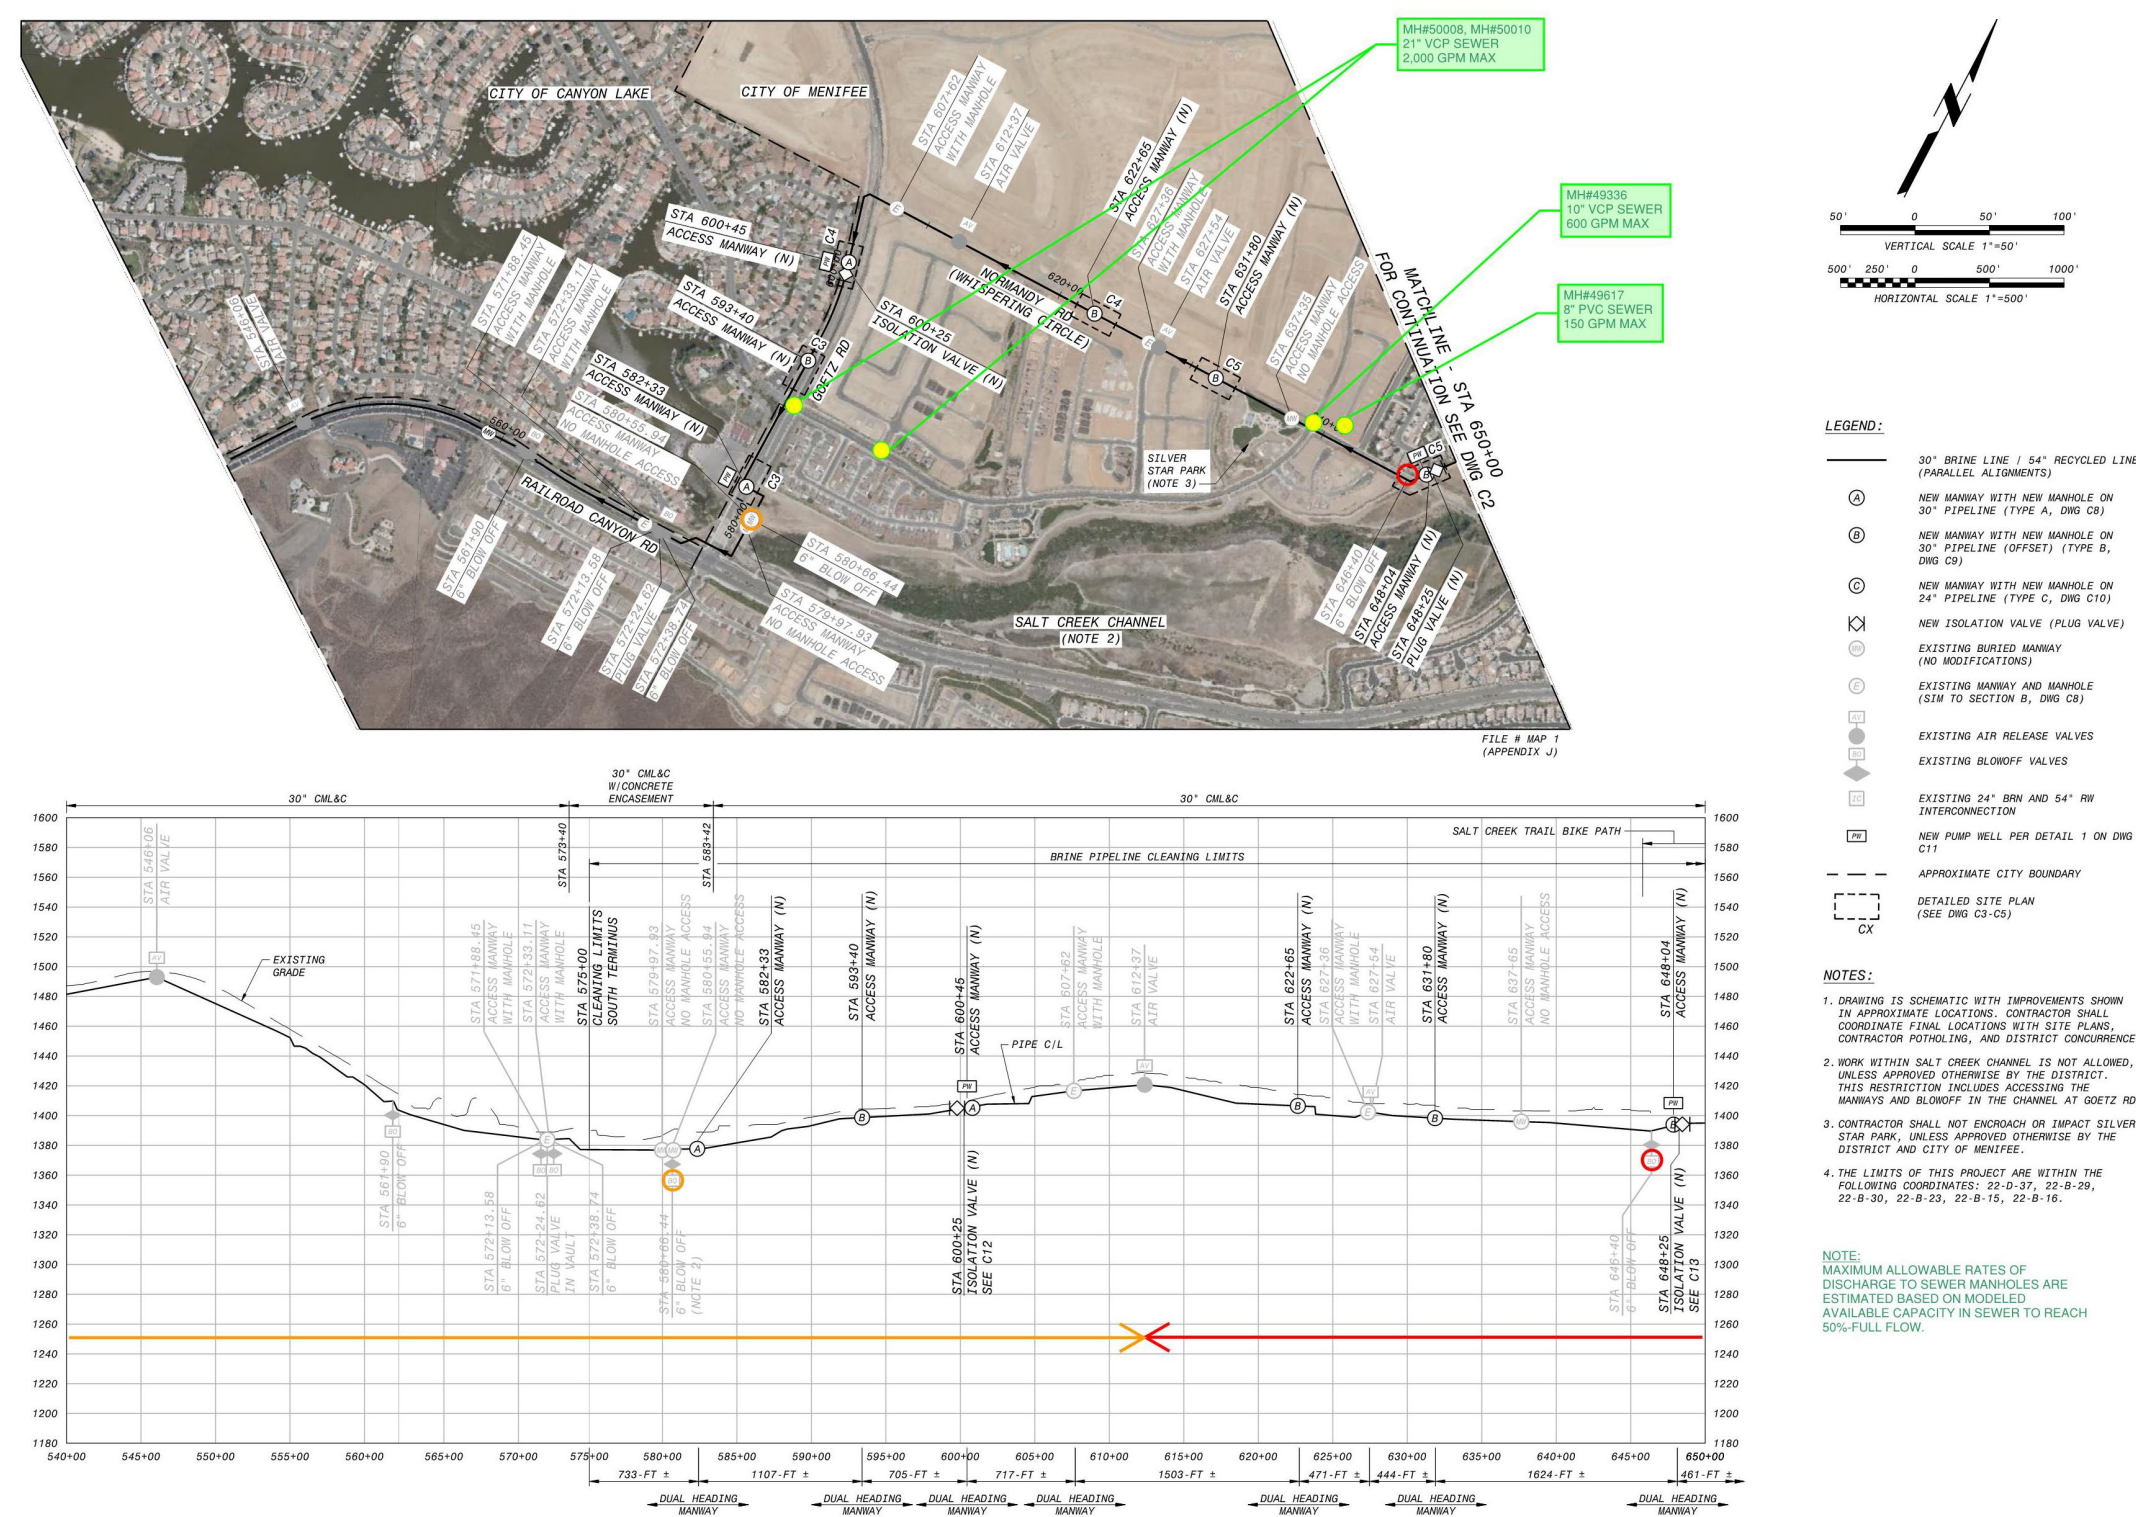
Brine Pipeline Dewatering – Sewer Manhole Locations
